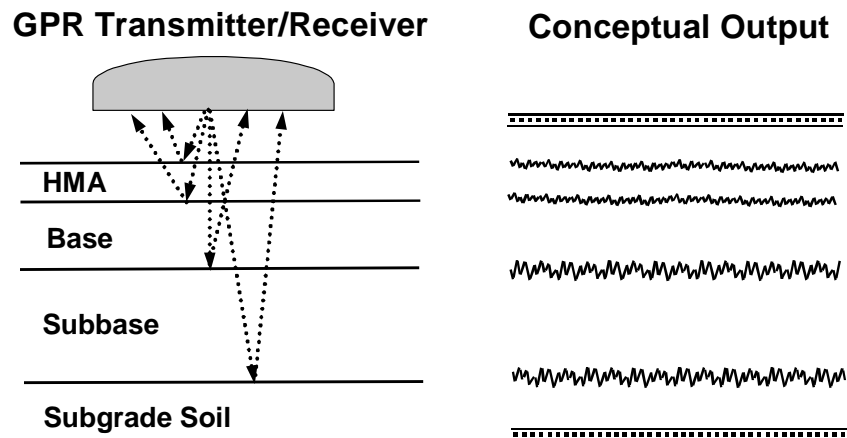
A schematic showing a pavement structure under GPR testing (2).
